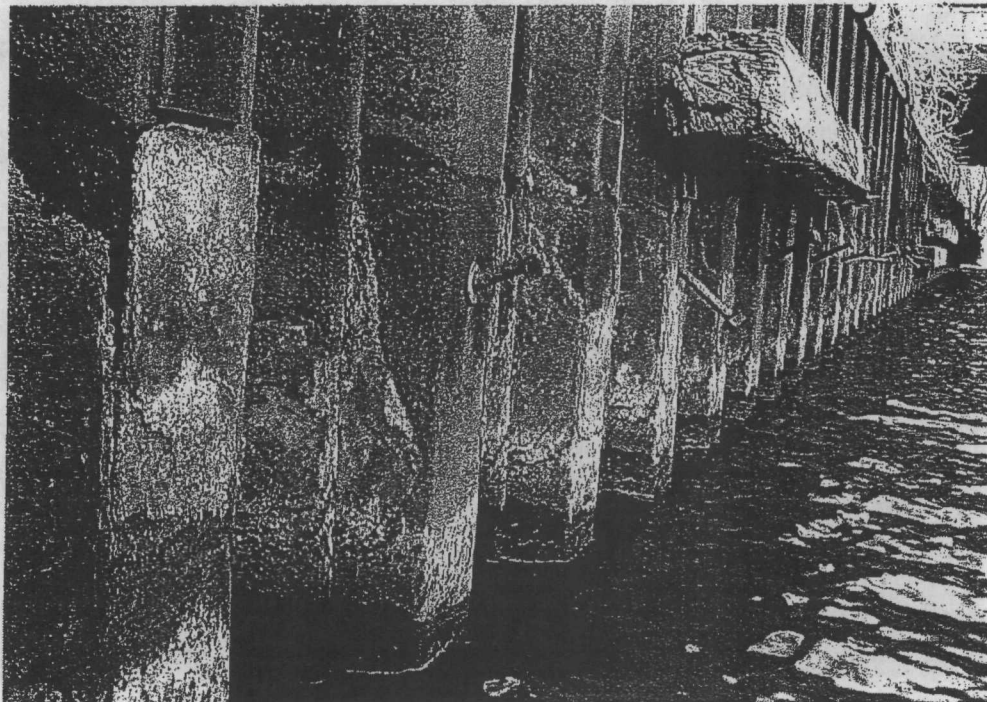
View of Typical Steel Condition at Station 8+00, Looking West.
